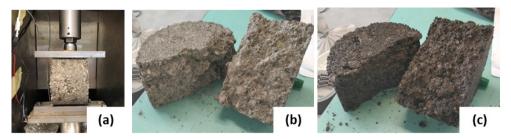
ITS test configuration (a) and post-test dry (b) and wet (c) specimens
